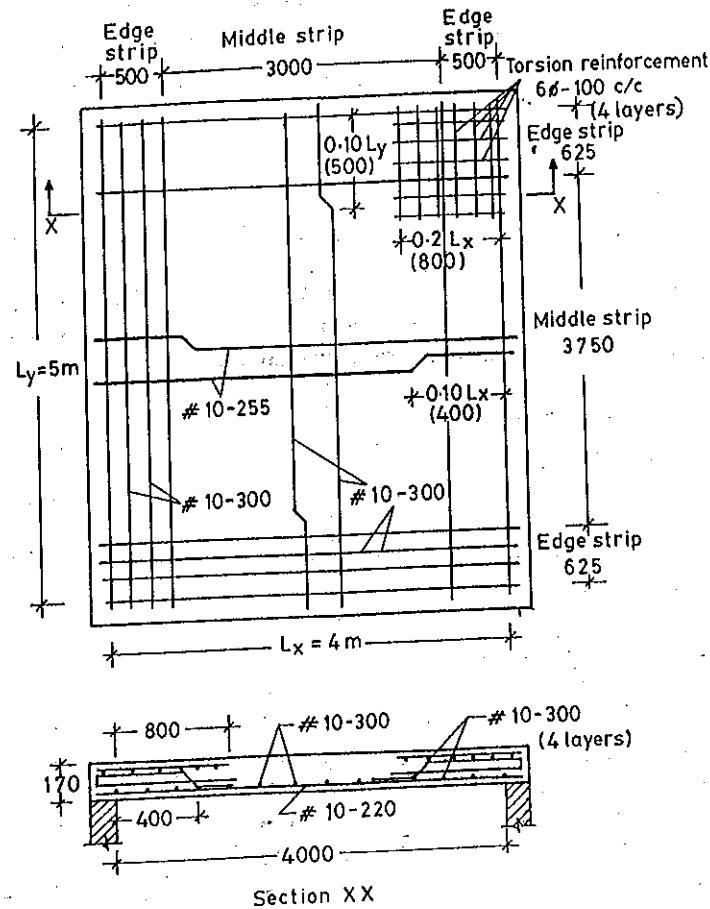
Reinforcement Details in Two Way Slabs
